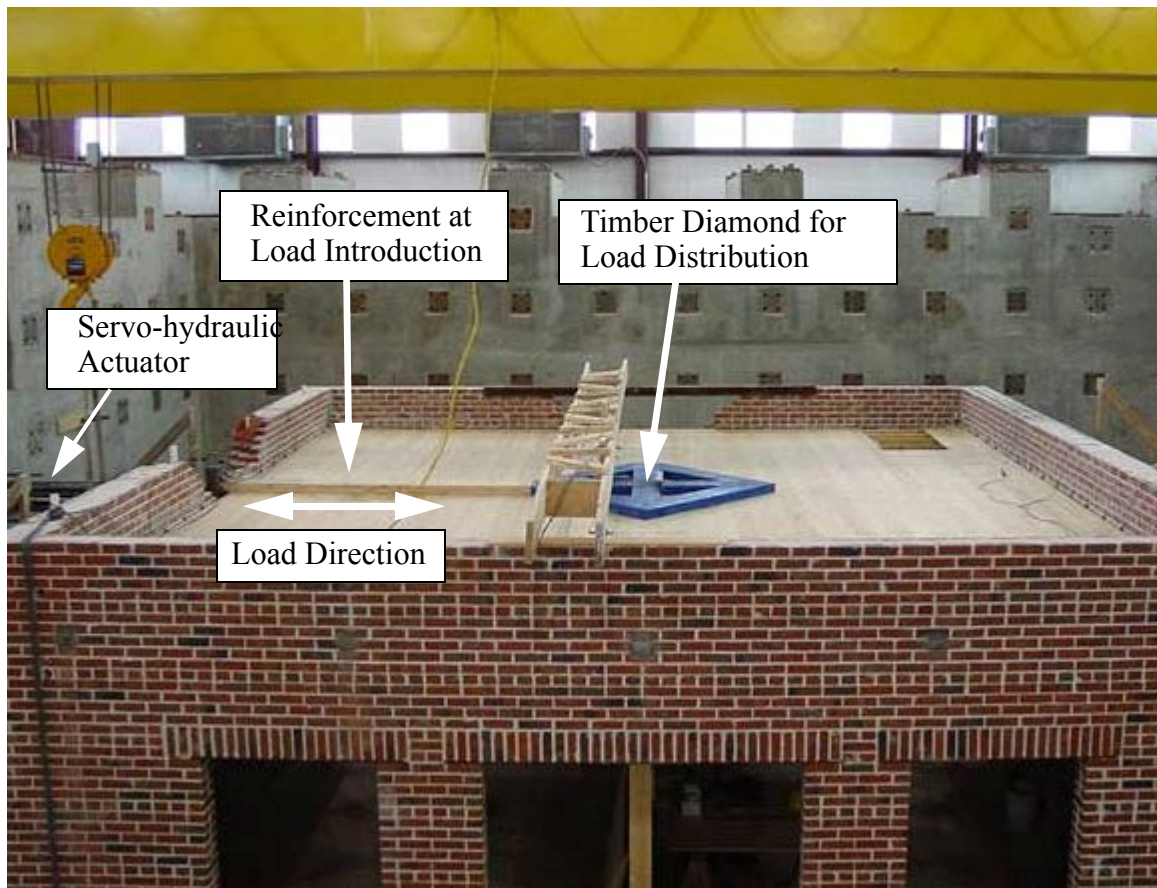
Photograph of diaphragm and out-of-plane wall test setup
